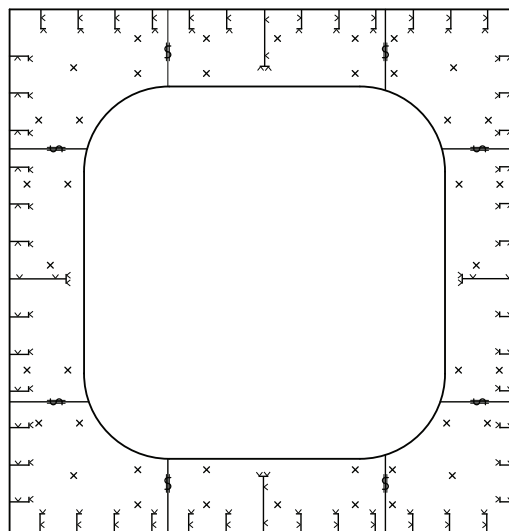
Typical location of measurement for pontoon bulkhead of column-stabilized unit and TLP
